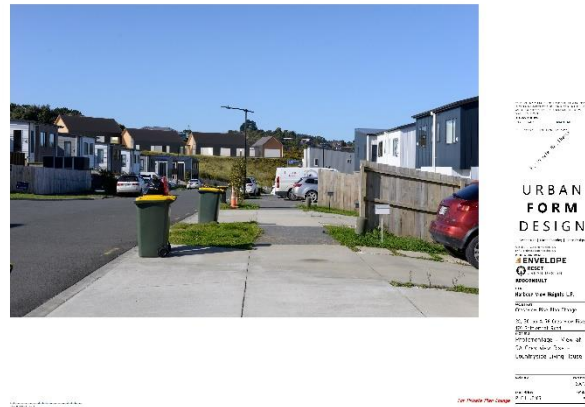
Photomontage - View at 9A Crestview Rise, refer to the urban design drawings, Sheet UD187
